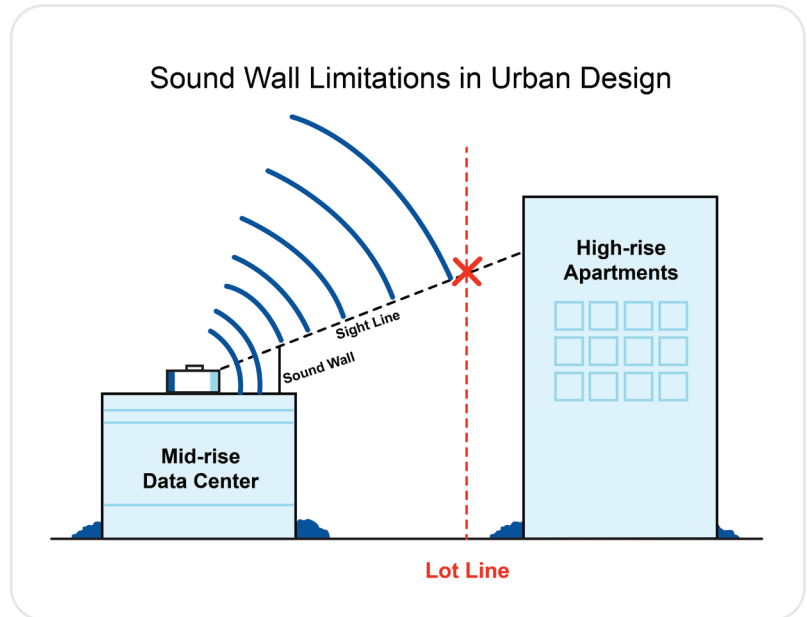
Rooftop sound walls are limited in height by structural constraints, and nearby high rise buildings will see no benefit from them because their line of sight clears the barrier.
